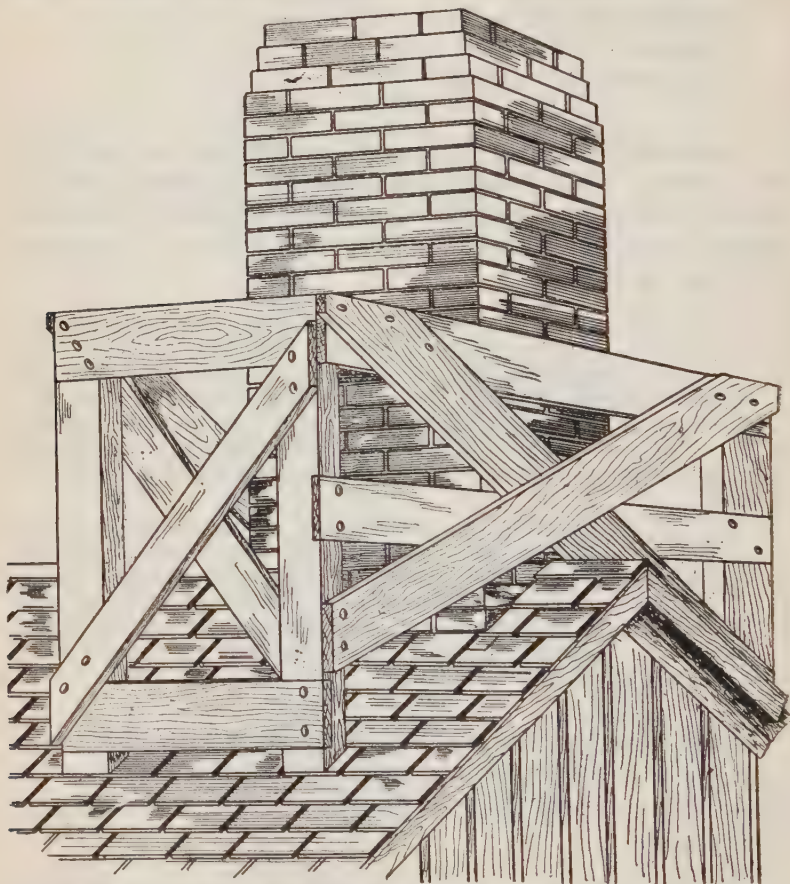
,080.—Chimney scaffold. As shown the scaffold is designed to straddle the roof ridge but may be made to fit one side by extending braces up to fasten over the ridge, or a cleat along the lower side. Its sections may be made on the ground and joined on the roof, working from ladders. It is obvious that it may be made any height.
